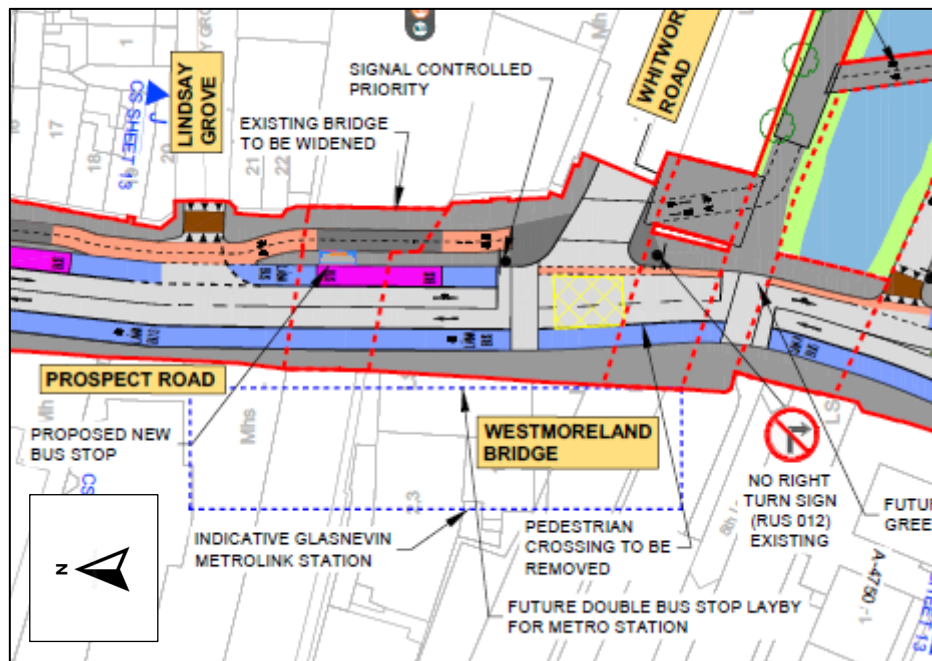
Extract from General Arrangement Drawing Sheet 13
